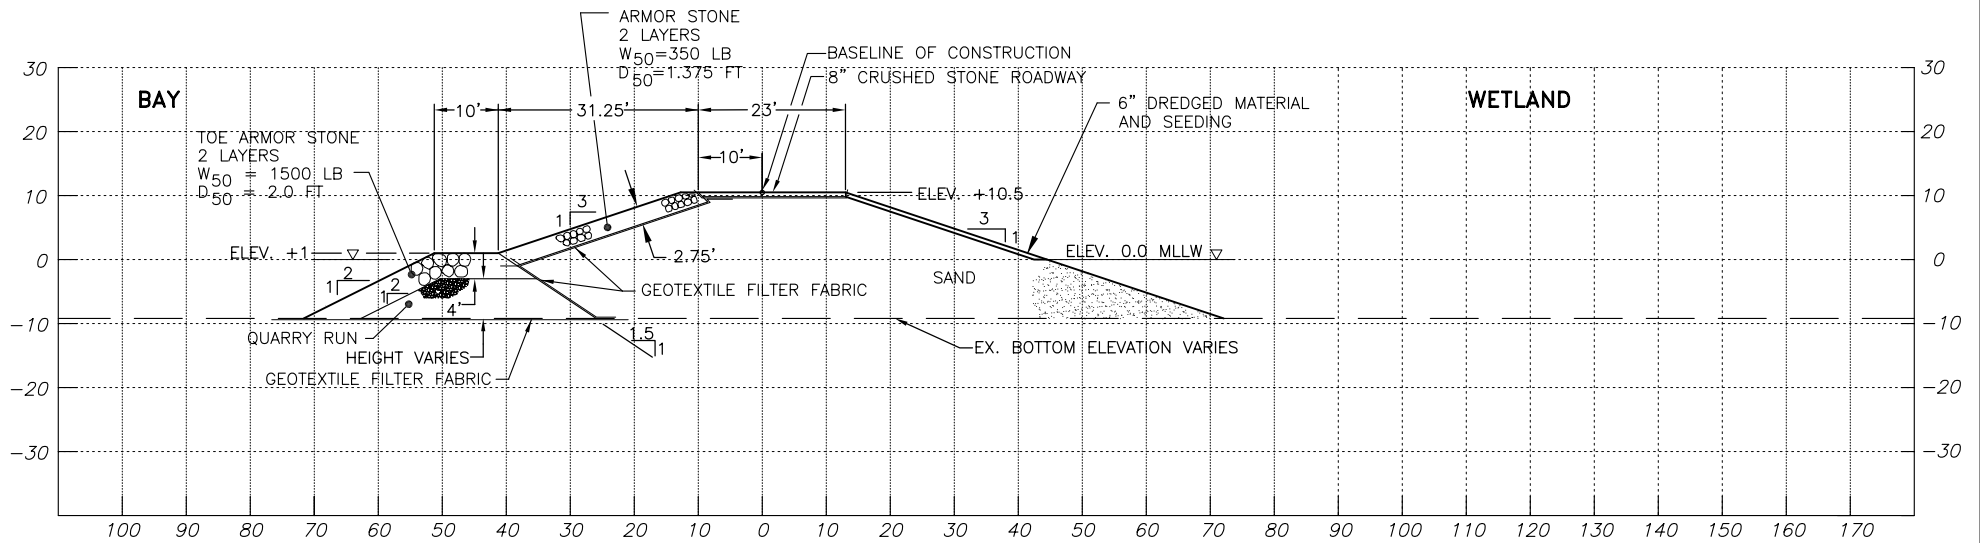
Layout of Typical Sections for Open Water Embayment Option
